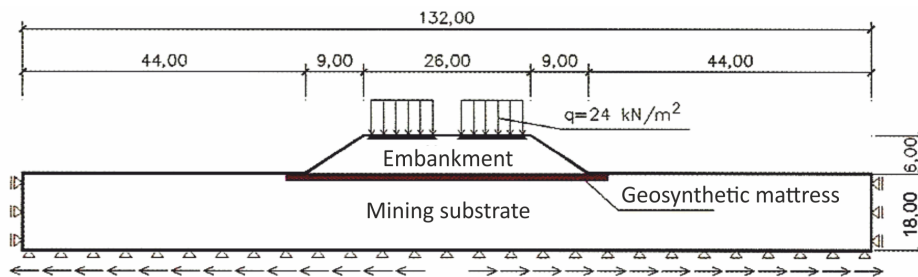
Calculation diagram for a railway embankment located on a mining substrate, with reinforcement in the form of a geosynthetic mattress, installed at the embankment base level
